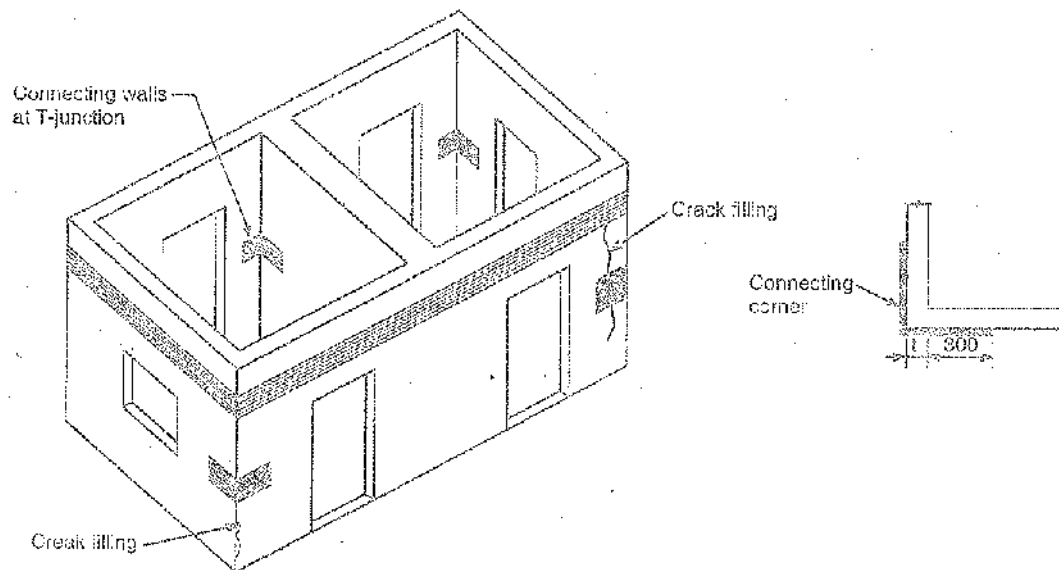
(f) Connection of cracked walls at Corners and Junctions
